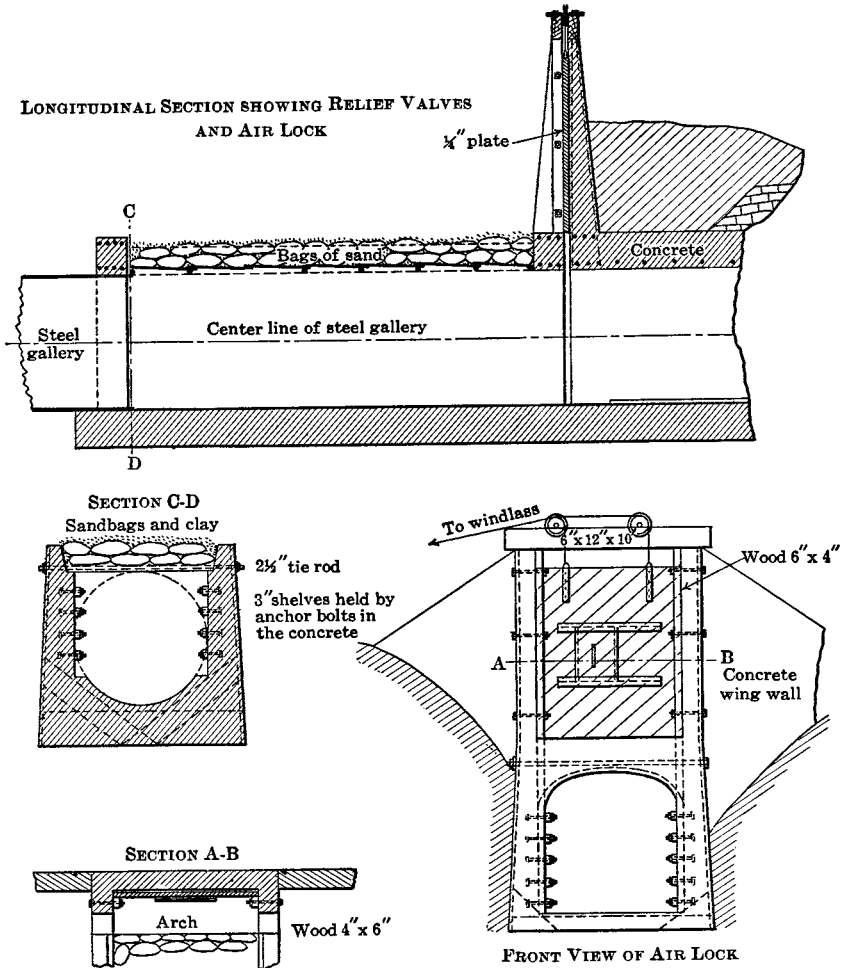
Sections of passage between steel gallery and diagonal entry.
